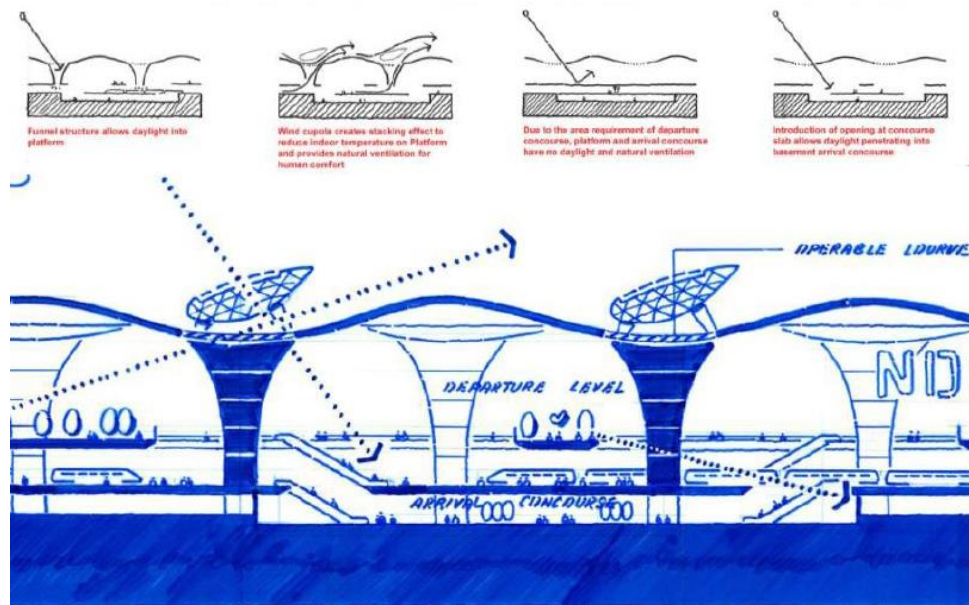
Rain water collection, natural light and ventilation, PV, New Delhi Station (Source: Krummeck, 2009)
